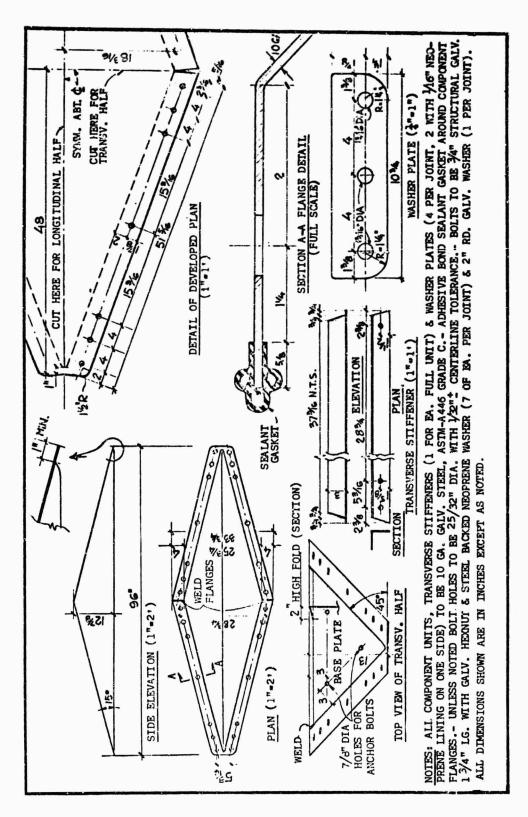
UFP component unit, 8 ft long, single-skin type, 10-gage steel.
